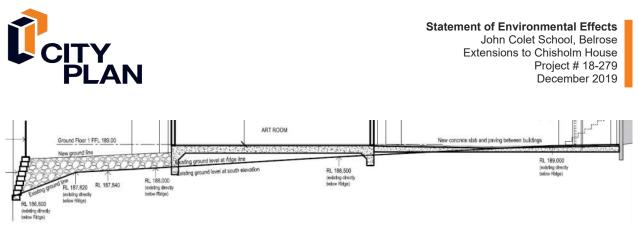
Extract of Section 1 showing the excavation and fill proposed for the proposed works (Source: Templum Design Architects)
